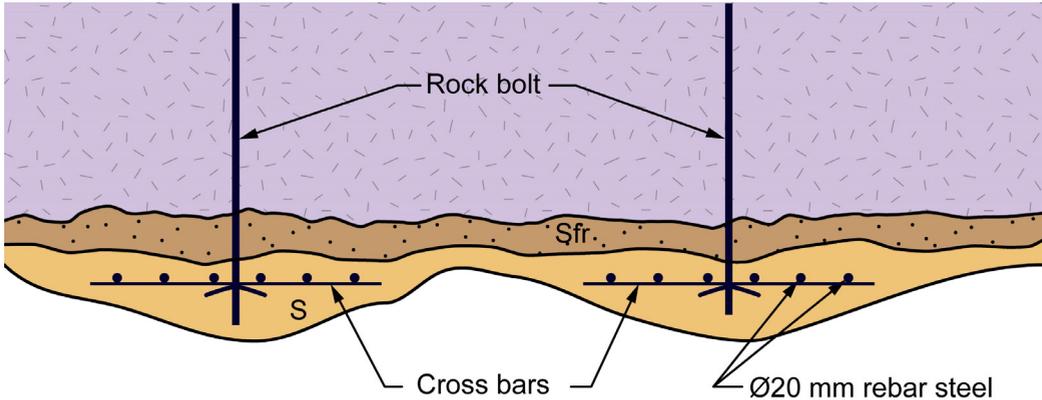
Construction principle for reinforced ribs of sprayed concrete (RRS). Note that the initial layer (smoothing layer) closest to the rock surface is fibre-reinforced sprayed concrete (Sfr), while the outermost layer of sprayed concrete is without fiber (S).
